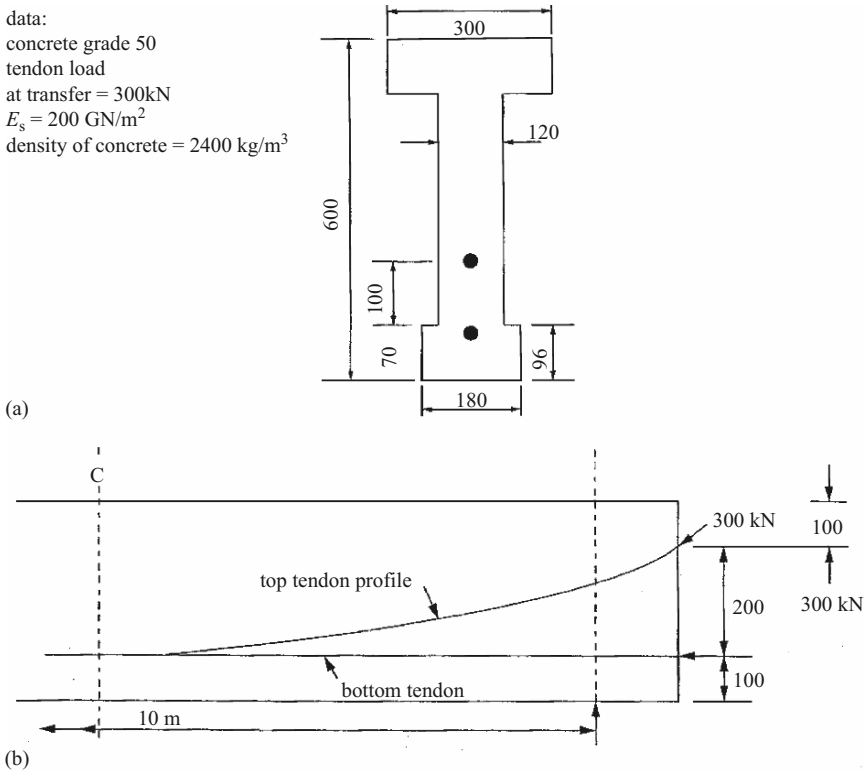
Model reinforced concrete beam: (a) cross-section; (b) longitudinal elevation
